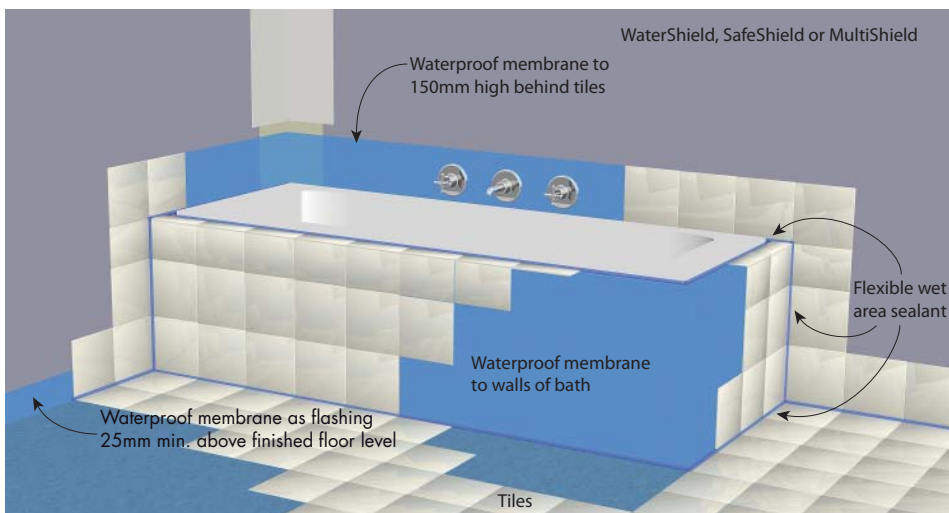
Bath (Without Shower) Installation on Timber Flooring
